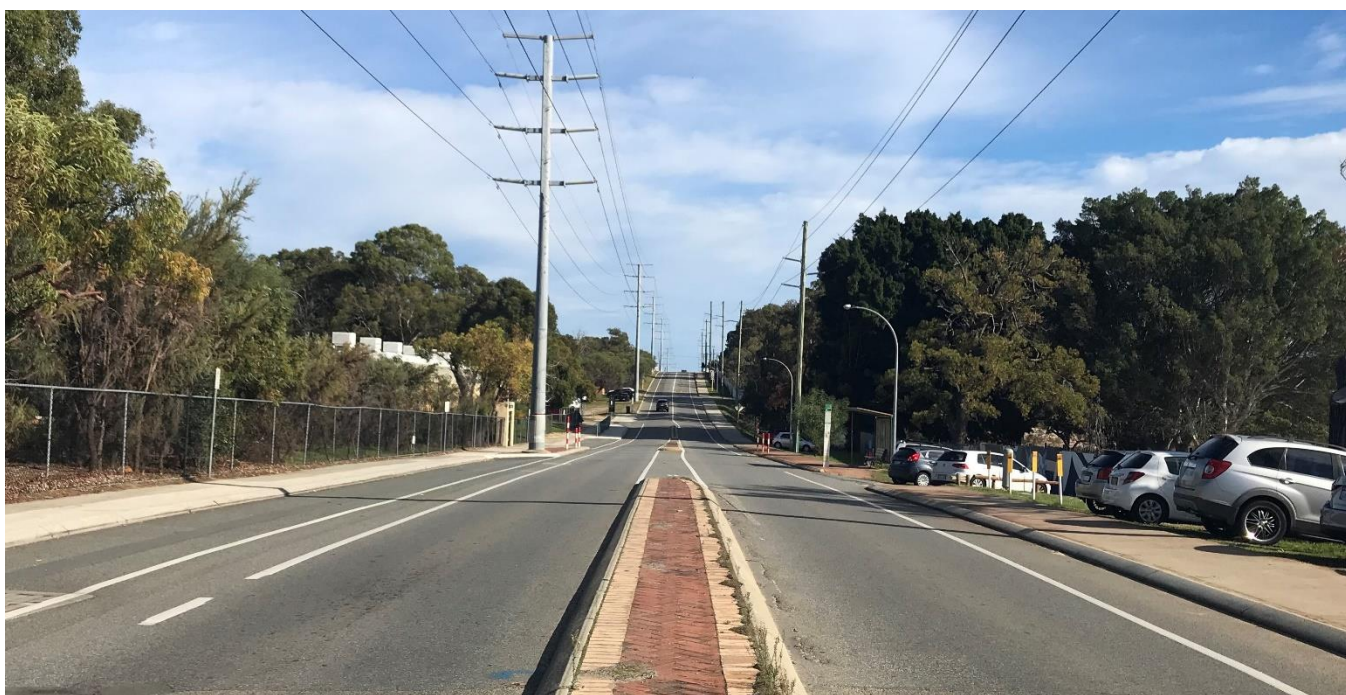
Lemnos Street cross section looking west (source: Flyt)
